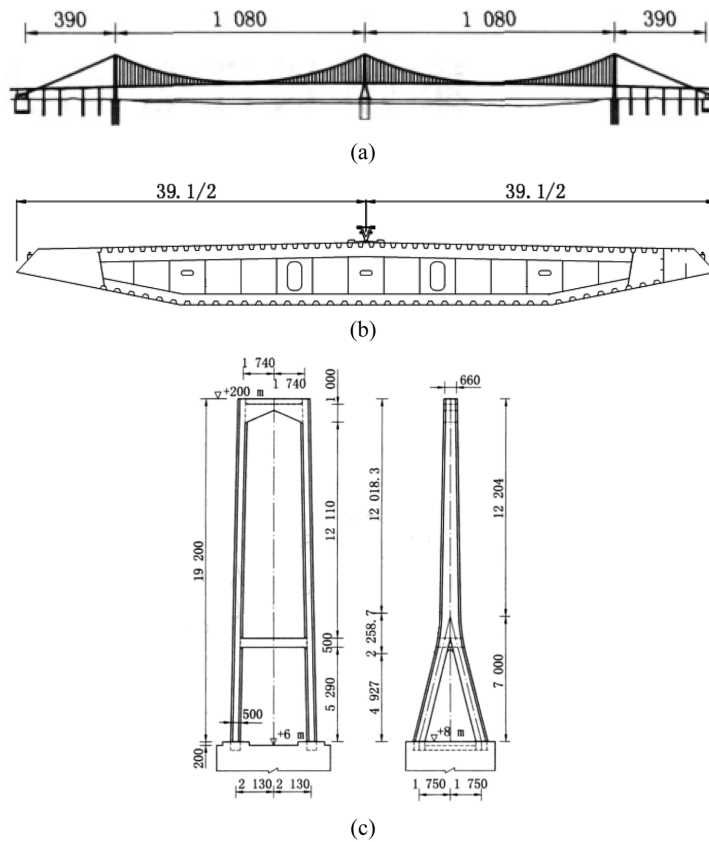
(a) Side view of the Taizhou Highway Bridge over the Yangtze River (Unit: m), (b) cross section of the bridge deck (Unit: m) and (c) the center tower (Unit: mm)
